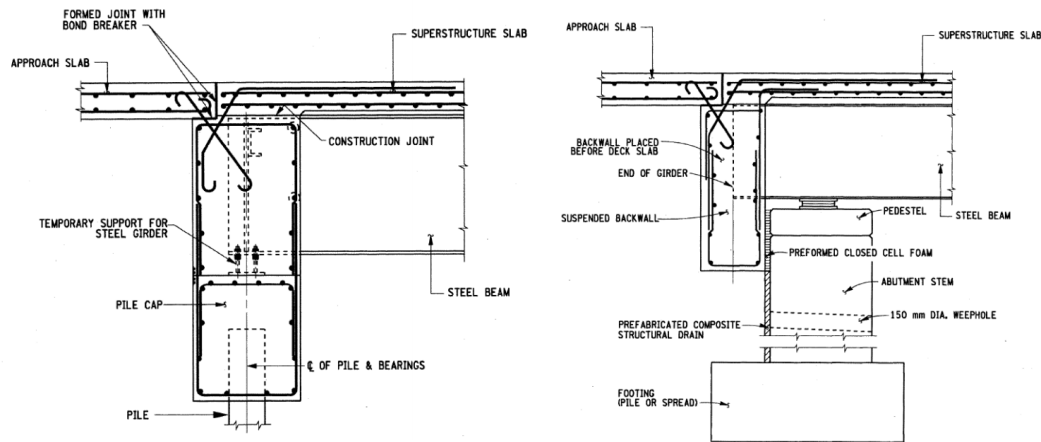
Integral abutment bridges deck-abutments joints details. (Image taken from [101])
